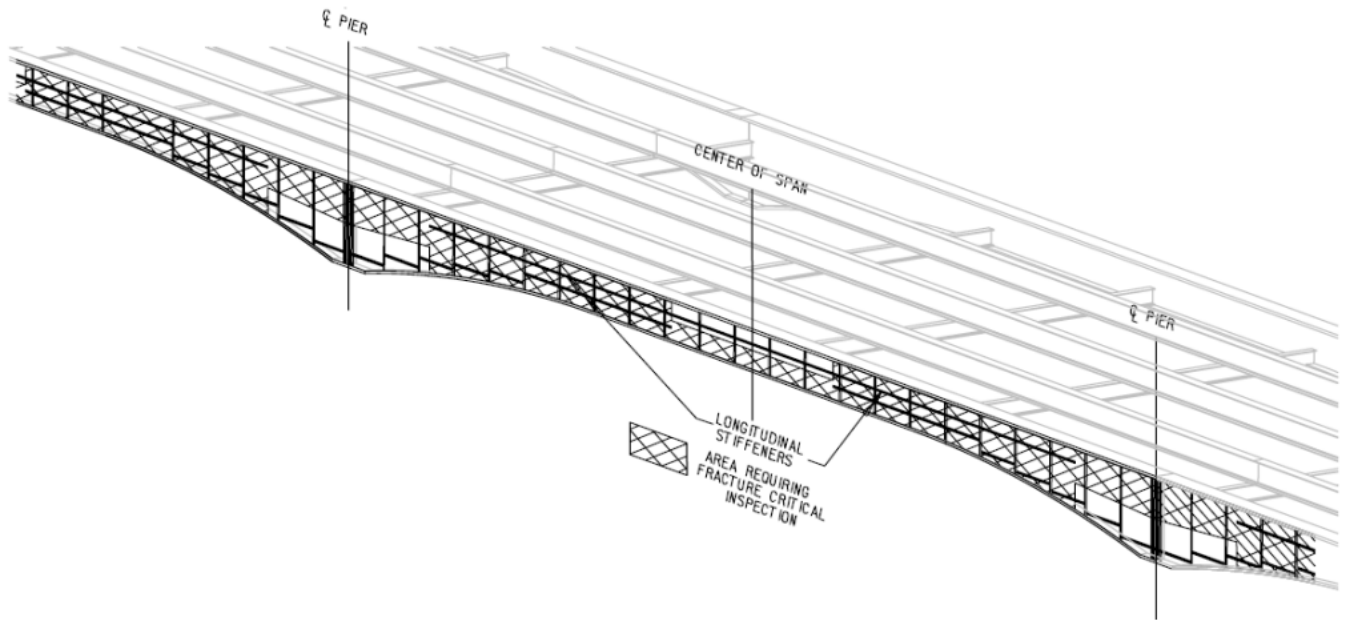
Main Girder Inspection with Longitudinal Stiffeners.
